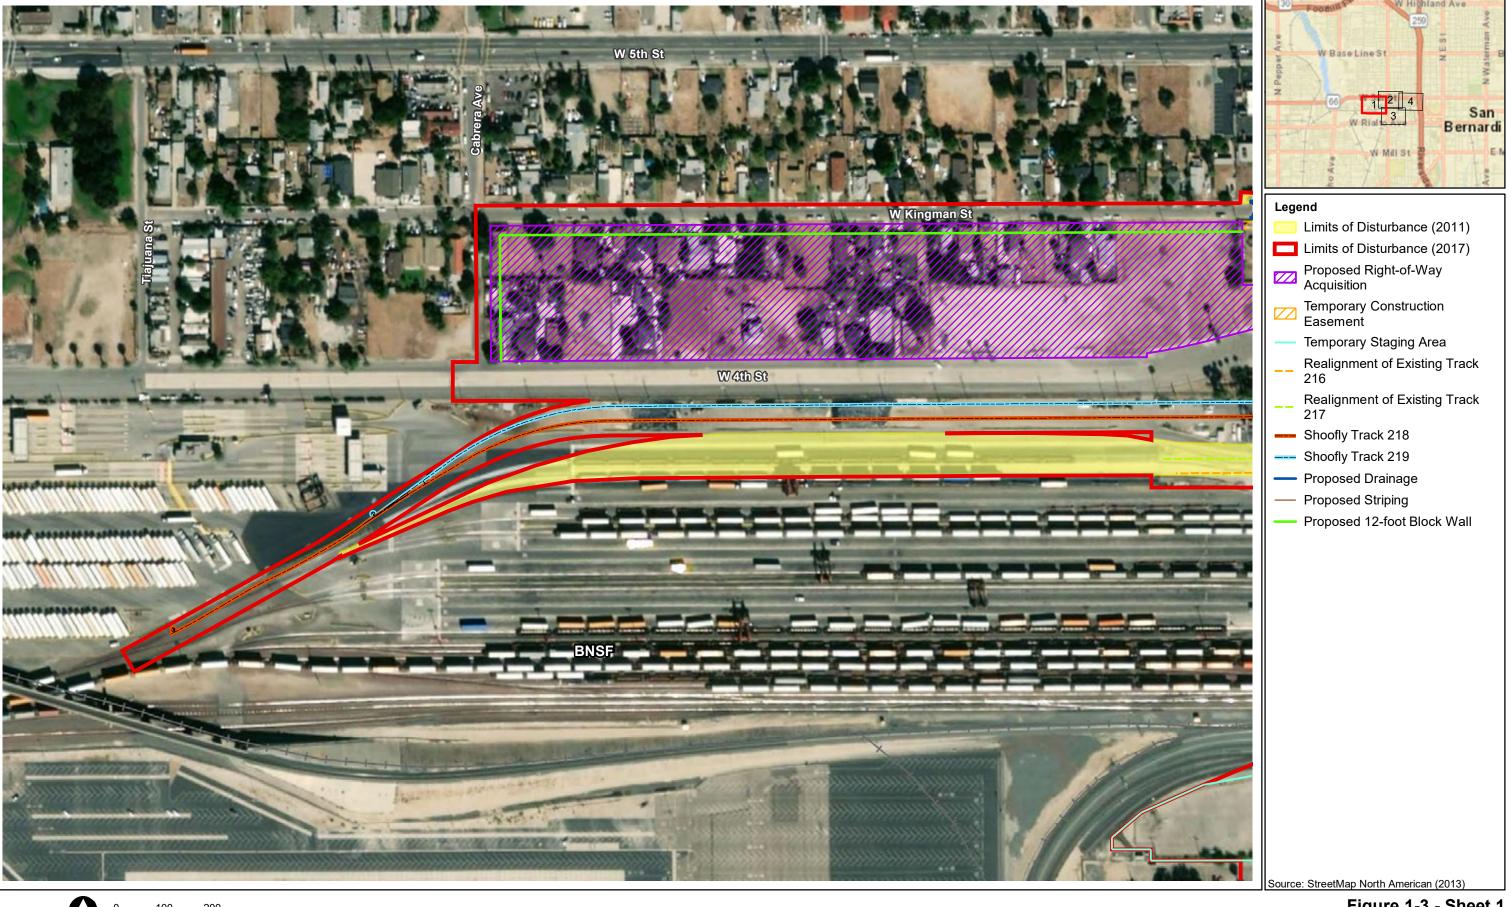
Project Layout Map Sheet Index Mount Vernon Avenue Bridge Project
